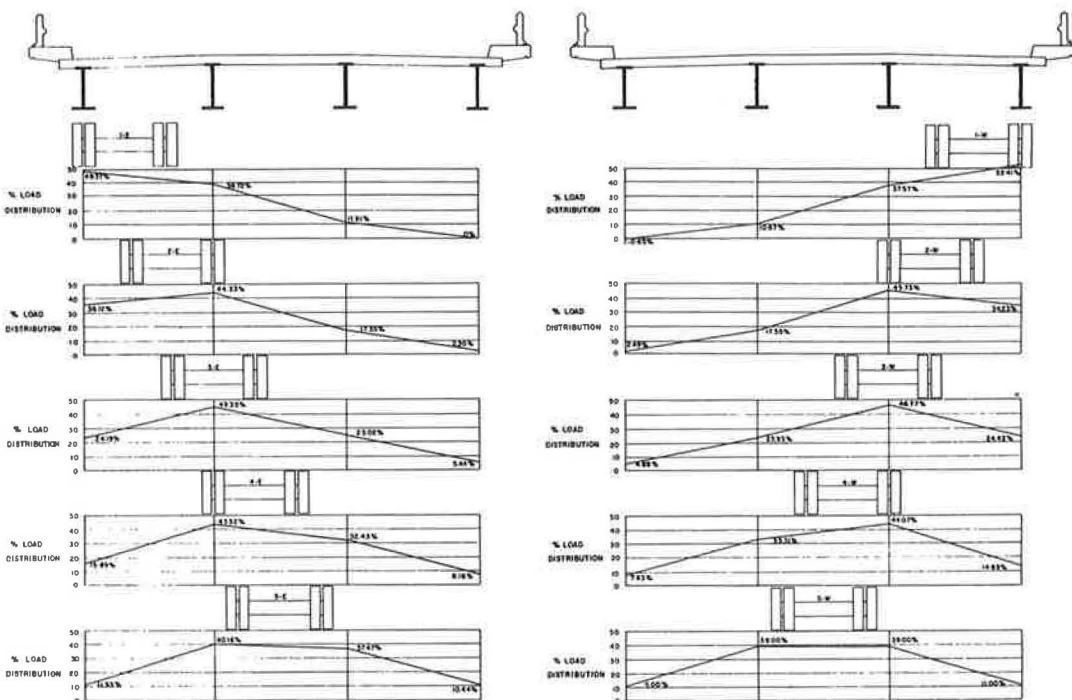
Static load distribution for aluminum stringer bridge at section 1.
